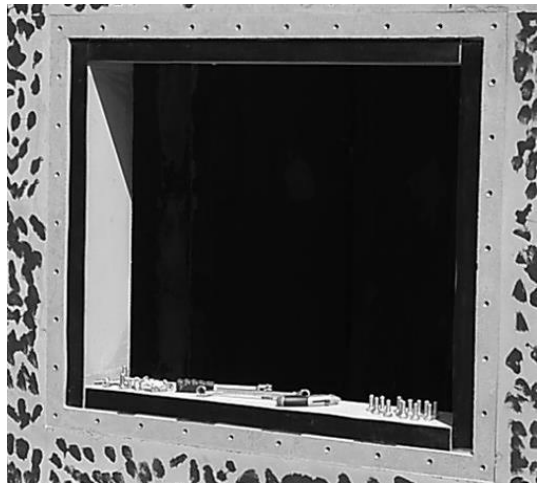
Window opening in concrete wall including rubber protective strips and embedded threaded sleeves.
